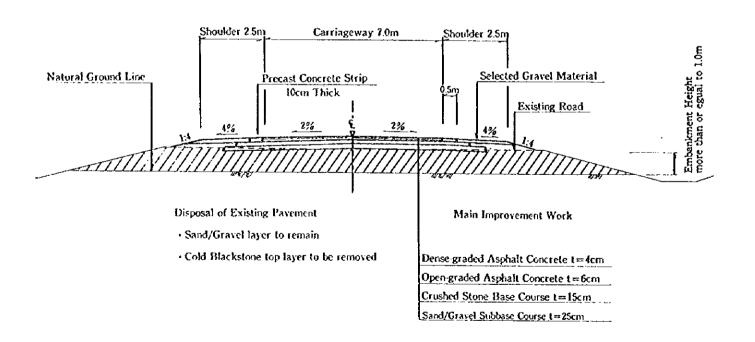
Cross-Section of Road for Type-III-2 Improvement
